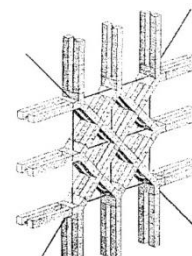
Typical module cast in cement concrete to help with faster and economically viable construction.
